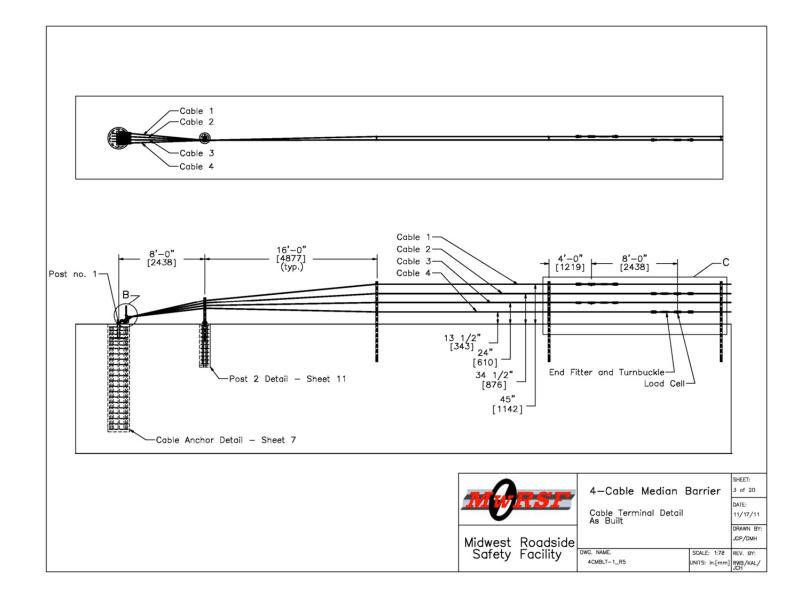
Cable Terminal Layout, Test No. 4CMBLT-1
